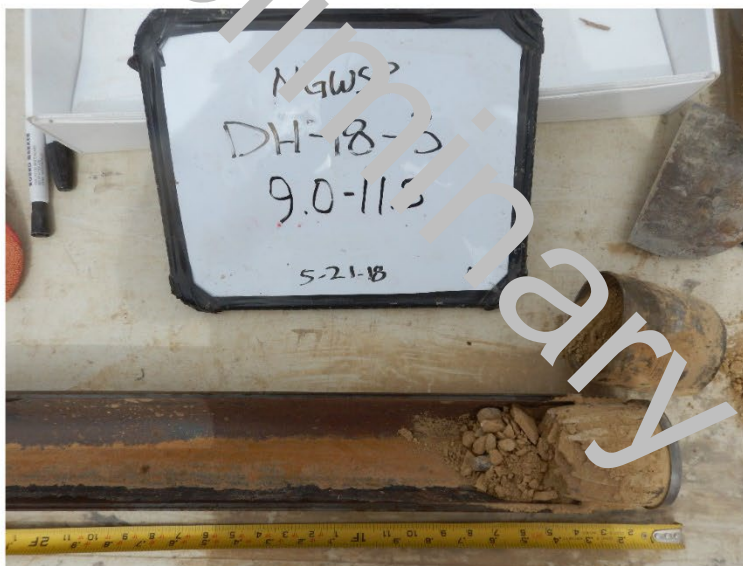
/21/2018 NGWSP SJWTP DH-18-3 (9.0-11.5 feet). Photo By: P. Gardner
